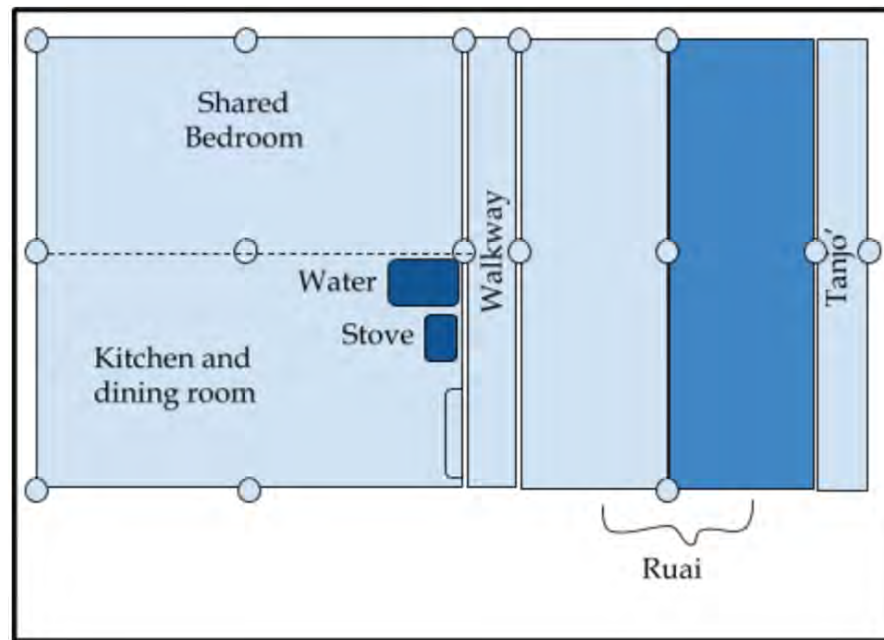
shows a digitalised floorplan of one bilik apartment of the first Rumah Panjang Melilas.
